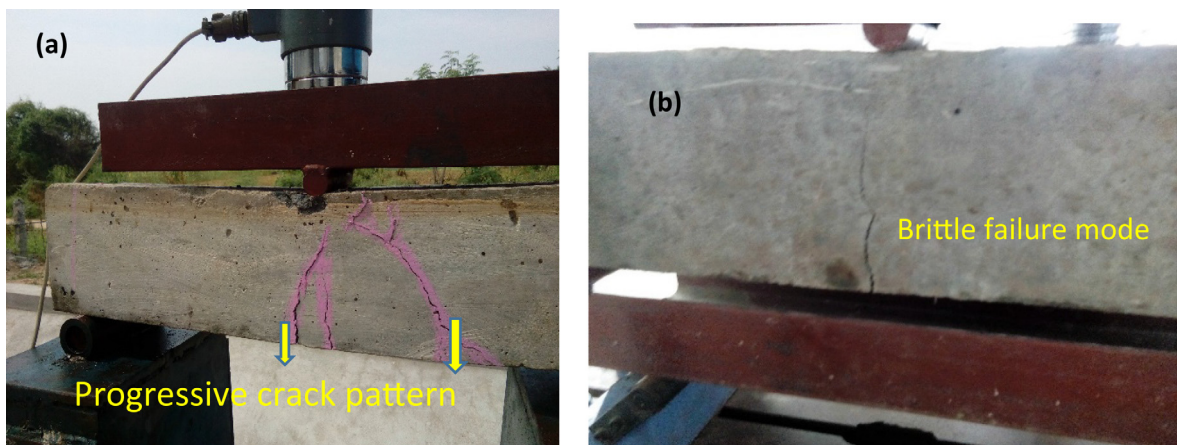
Typical crack pattern failure mode (a) Mc beam (b) BRC beam.
